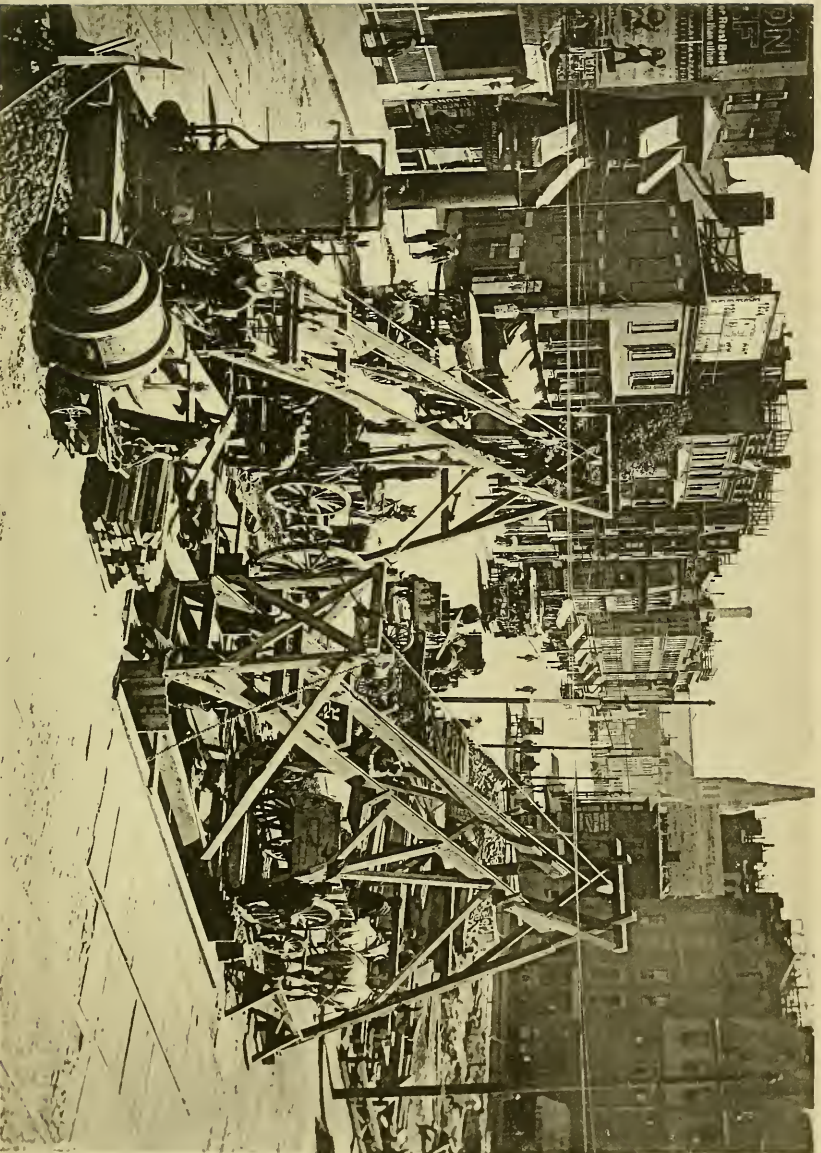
INCLINES AT JUNCTION OF SHAWMUT AVENUE AND TREMONT STREET.
